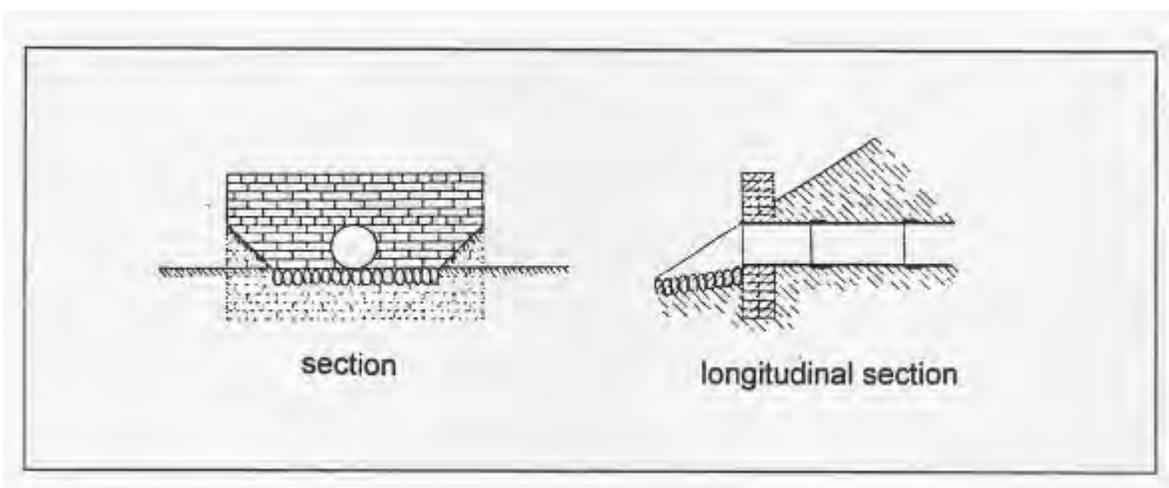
End elevation and longitudinal section of a pipe culvert under an embankment (Johnson 1899: 273, Fig. 8).
